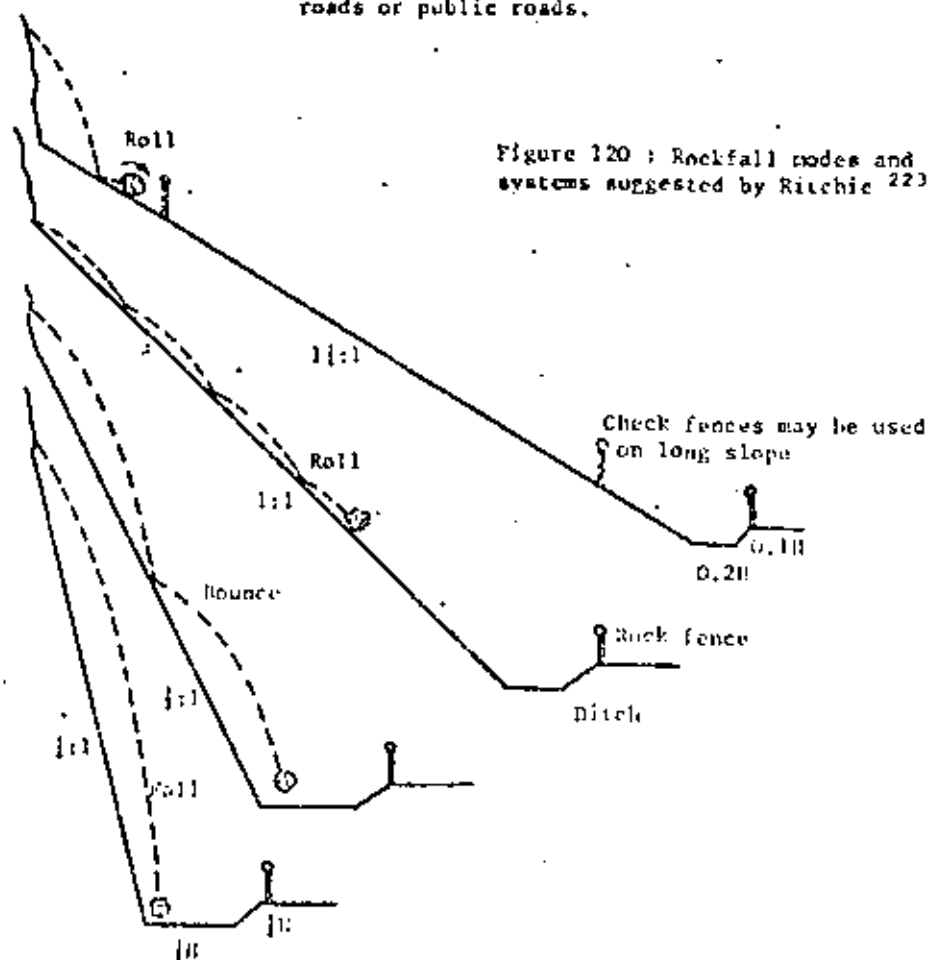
Rockfall modes and protection systems suggested by Ritchie²²³.
